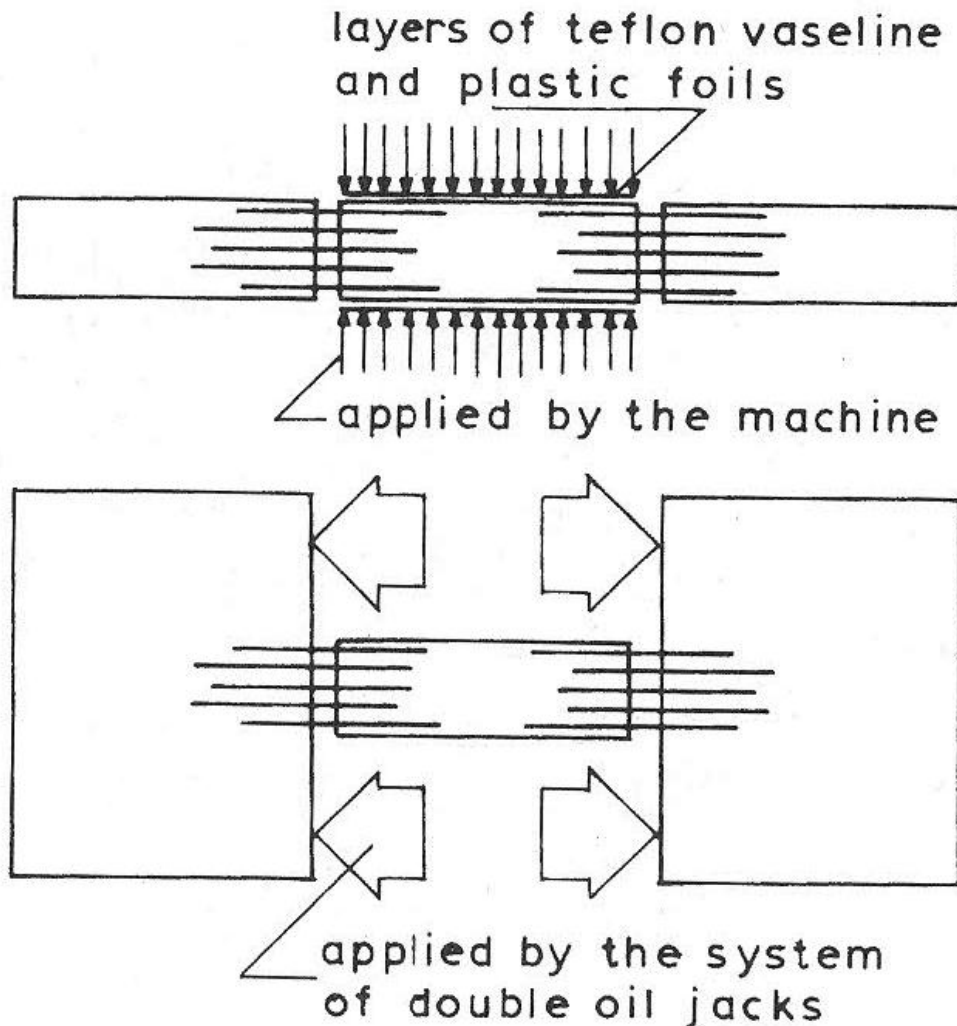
Biaxial Loading of Concrete Specimen [Demeke and Tegos, 1994]
